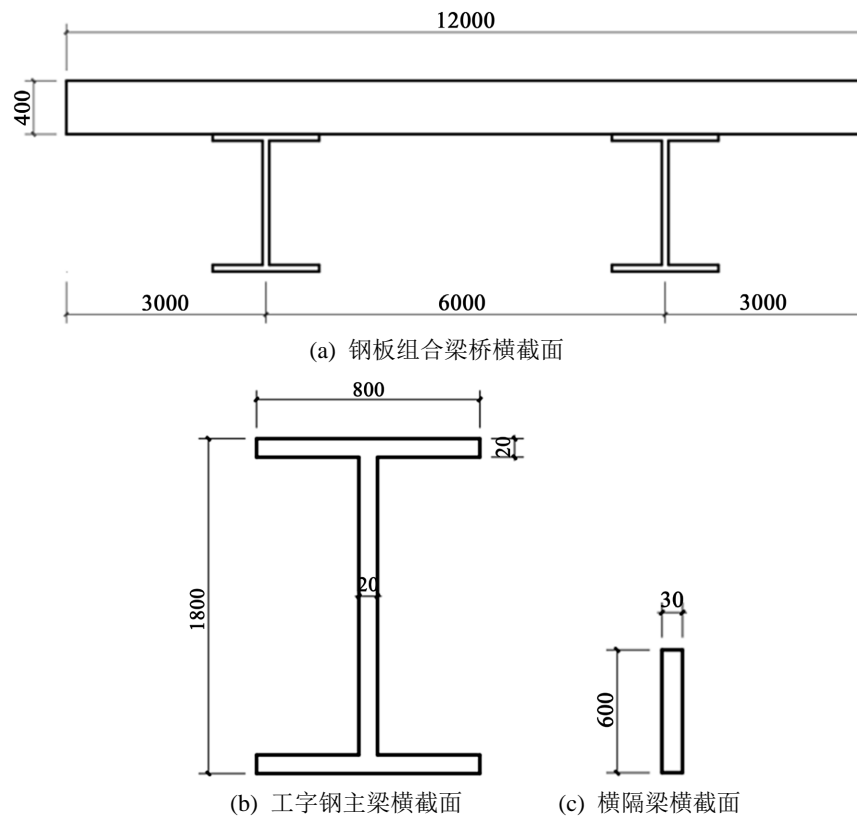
Basic cross-sectional parameters for steel plate combination girder bridge
